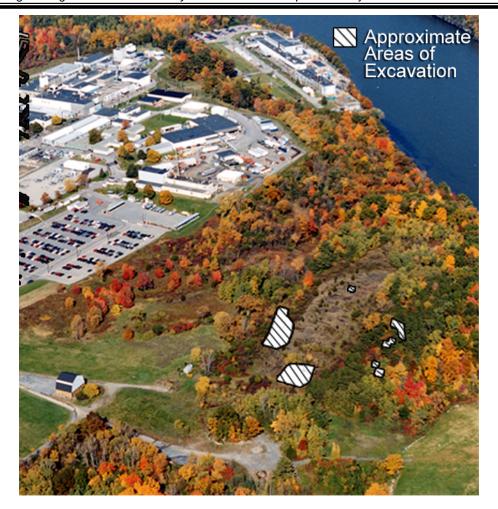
Assumed Areas of Excavation for Alternative NF-2
